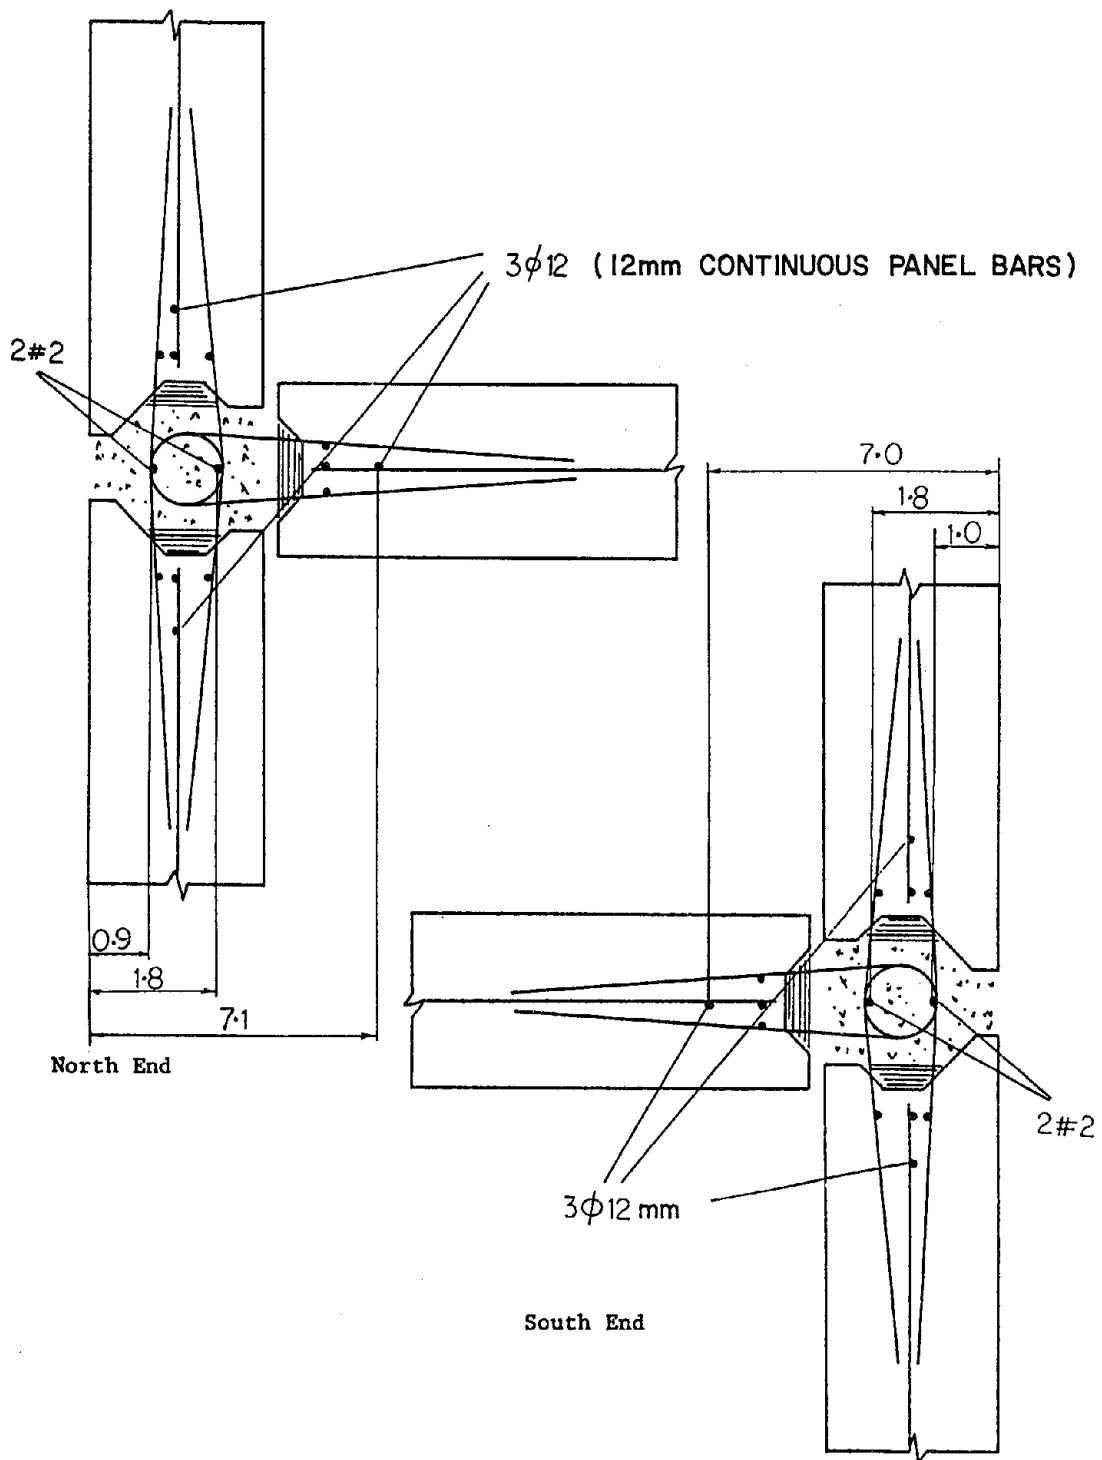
Joint details for flanged wall, PZ-III, (inch units).
